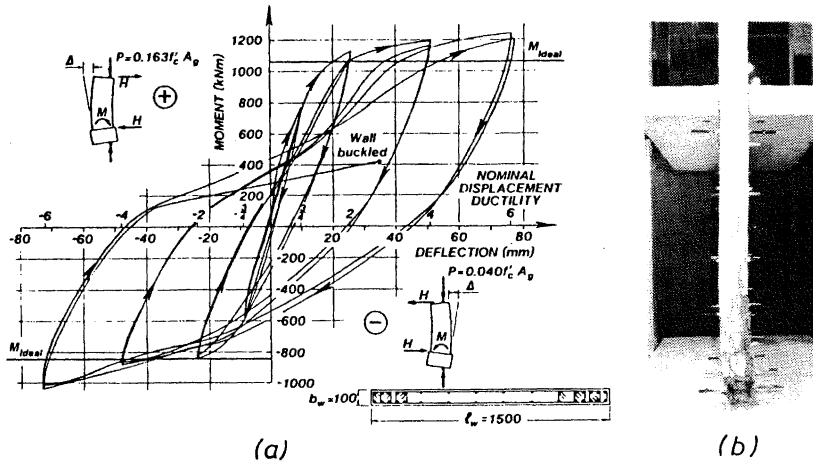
THE HYSTERETIC RESPONSE OF A DUCTILE WALL (A) AND ITS FAILURE DUE TO OUT OF PLANE BUCKLING (B)
